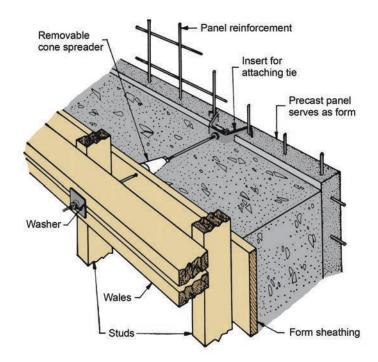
Wall form assembly showing how precast concrete panel serves as one face of the form
